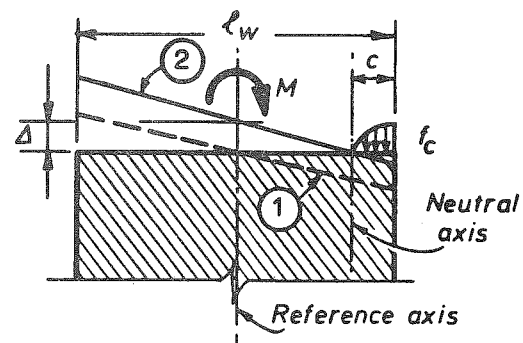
The Effect of Curvature on Uncracked and Cracked Wall sections
